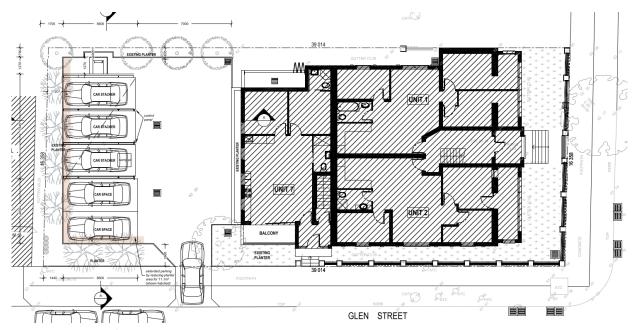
DA-392/2022 Proposed Ground Floor Plan
